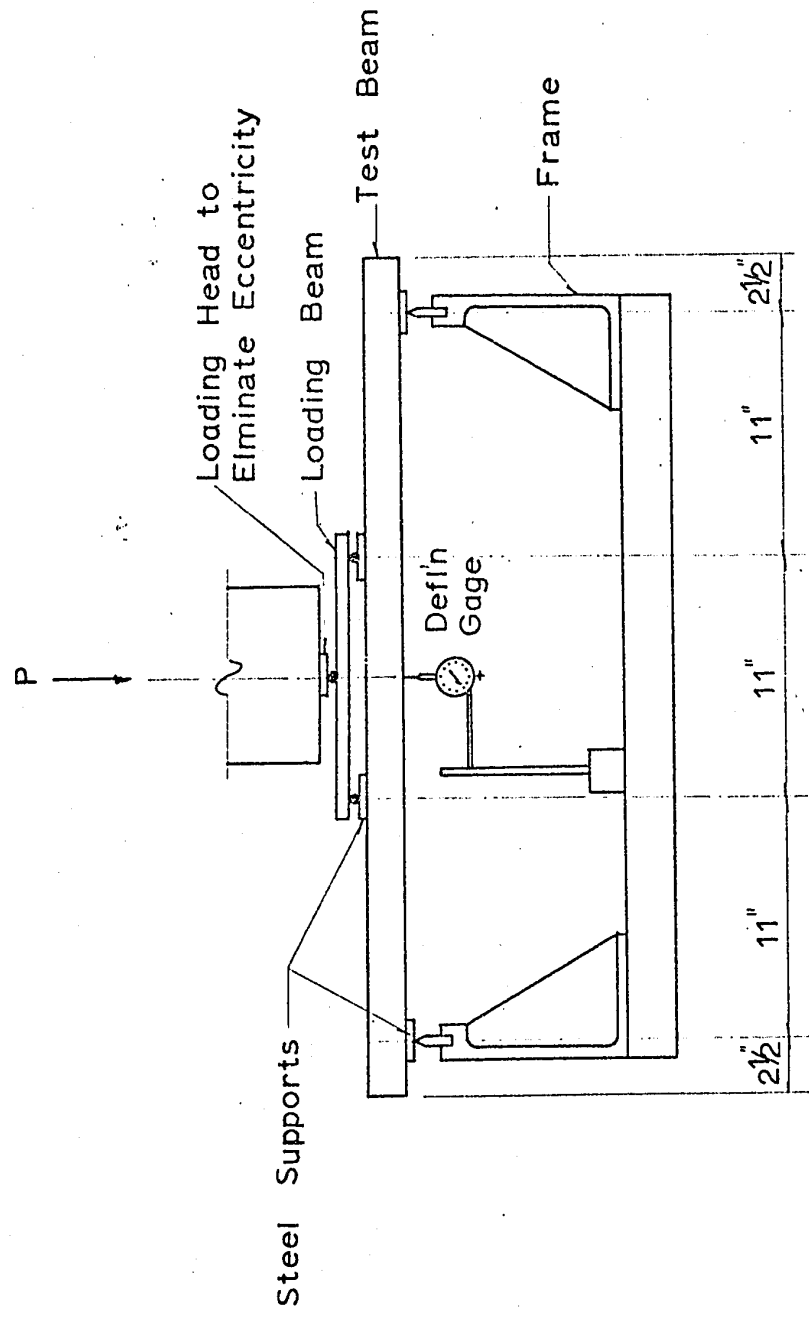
MODEL TEST SETUP FOR SIMPLE BEAMS
